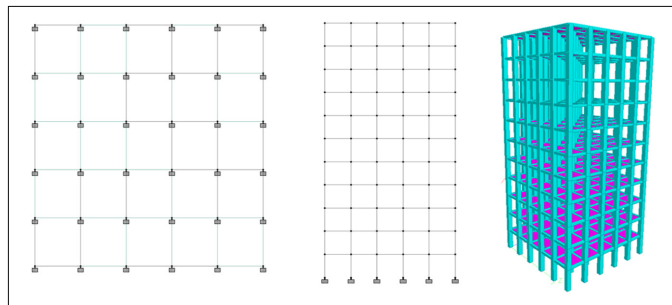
Plan, Elevation, and 3D View of G+10 RC Building Model
